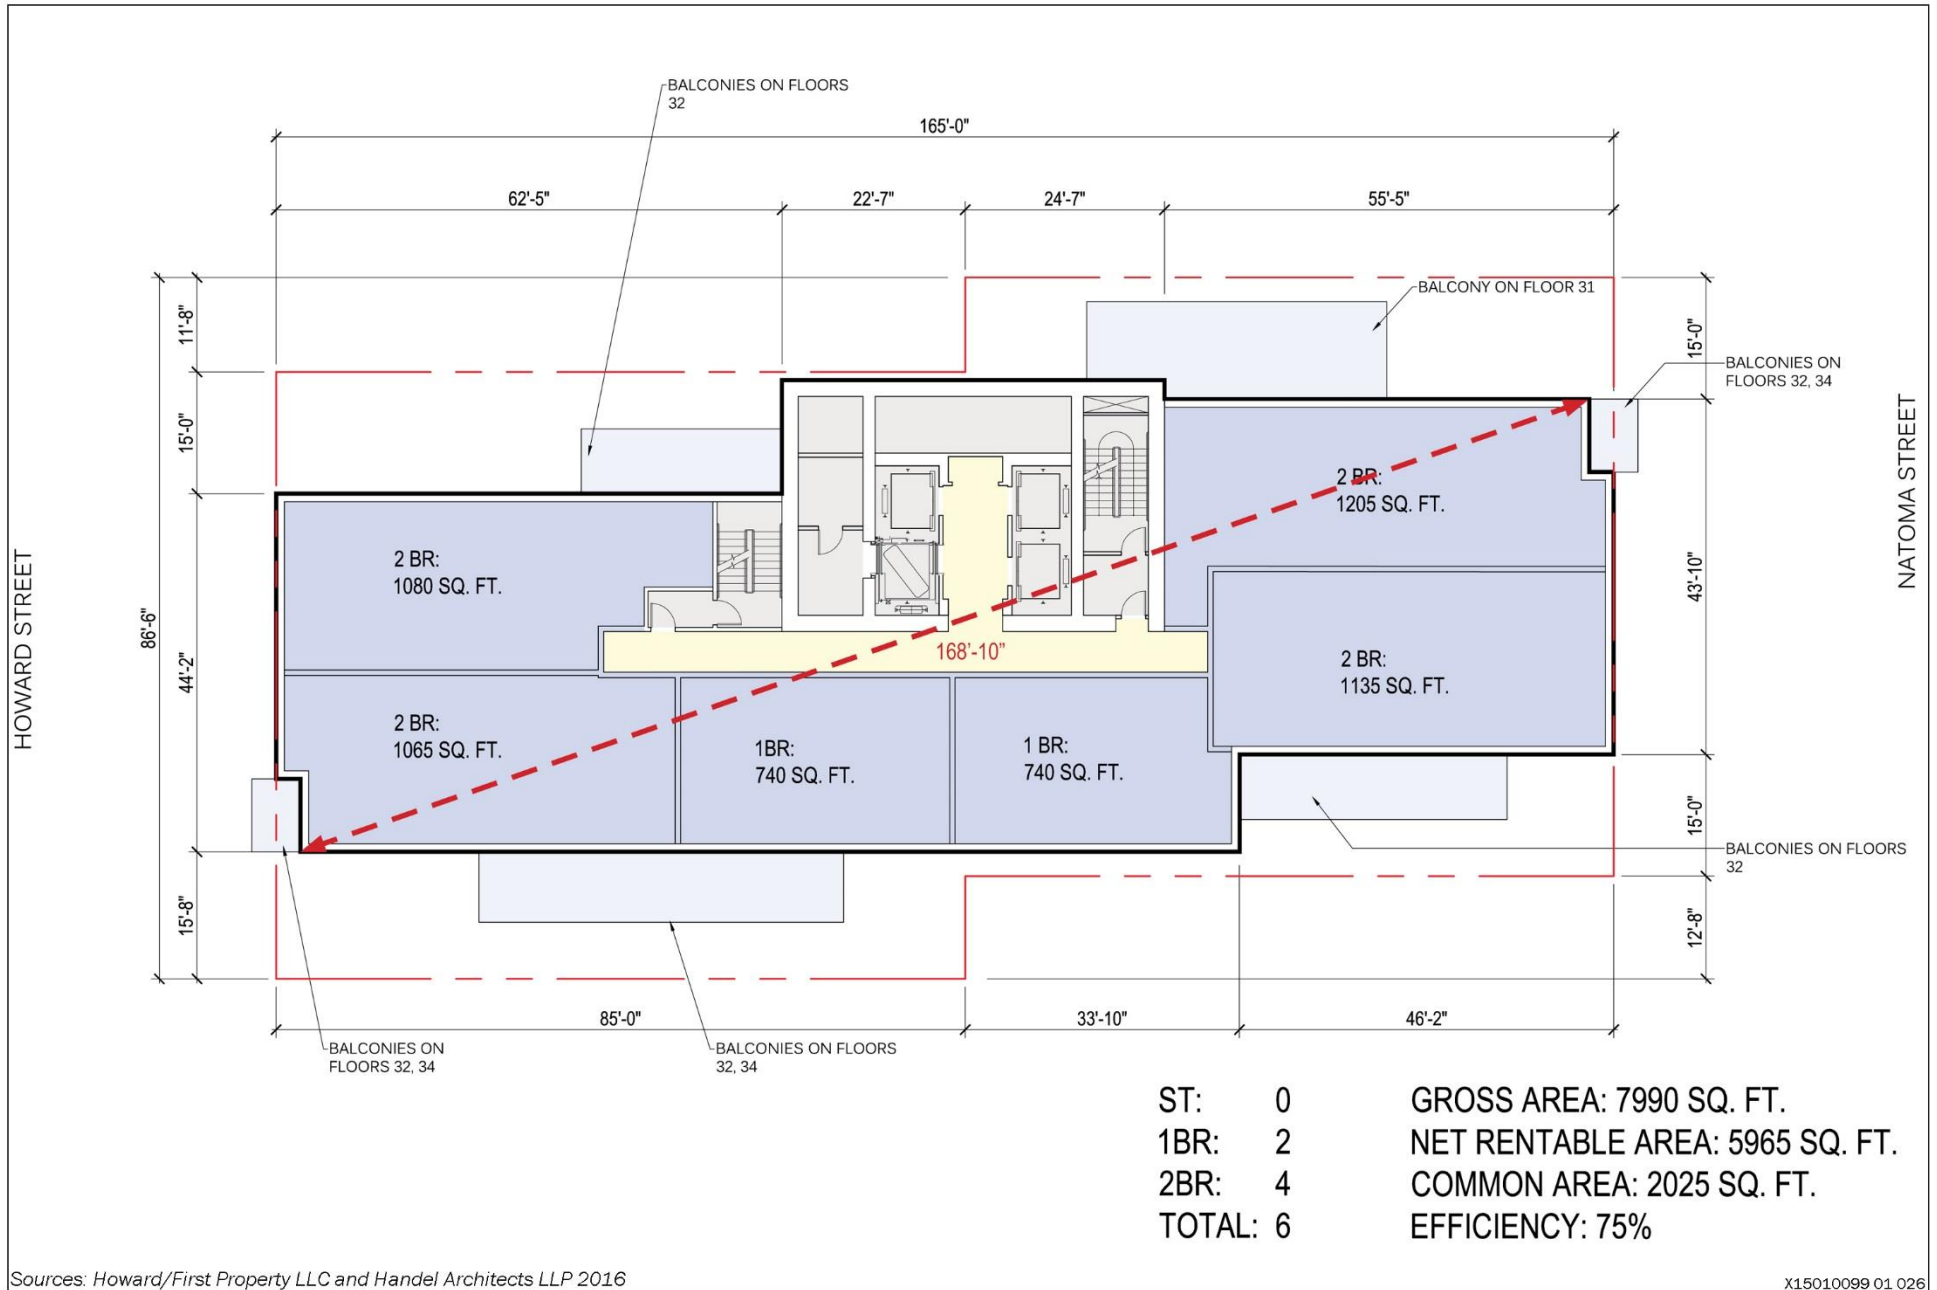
Conceptual Residential Floor Plan (Floors 31 through 35)
